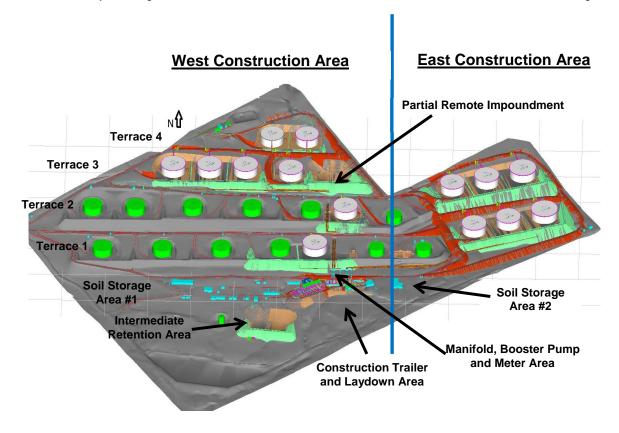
Burnaby Terminal Construction Scope Elements
